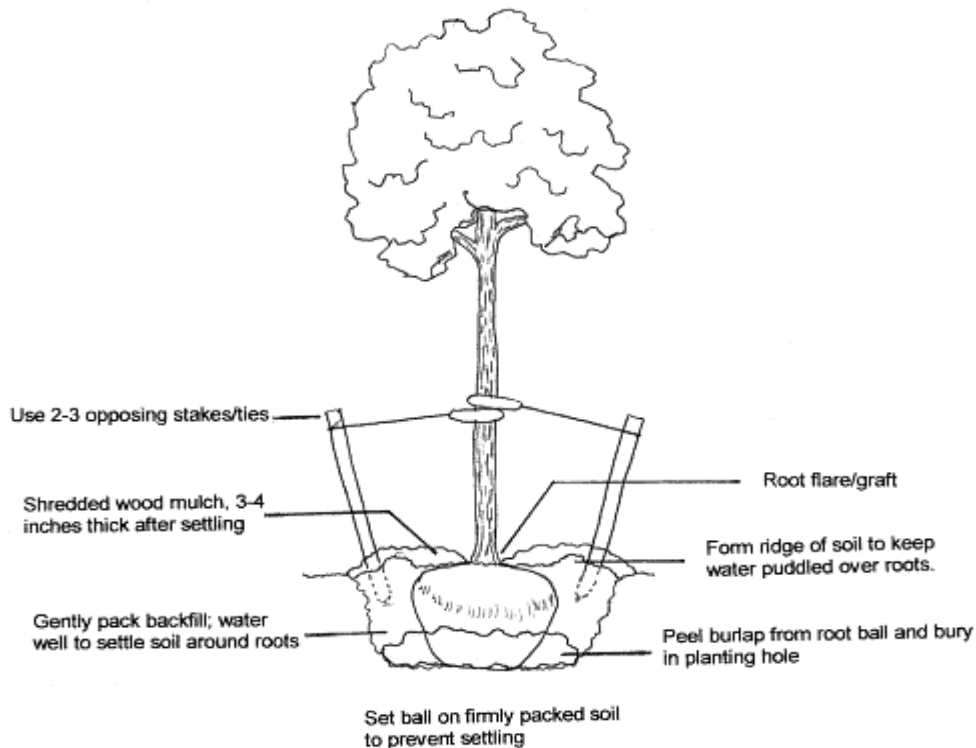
How to plant a B&B tree. Note: Only use 2-3 opposing stakes/ties when needed. Figure from the University of Minnesota Extension. See city standard detail for planting trees for additional details.
